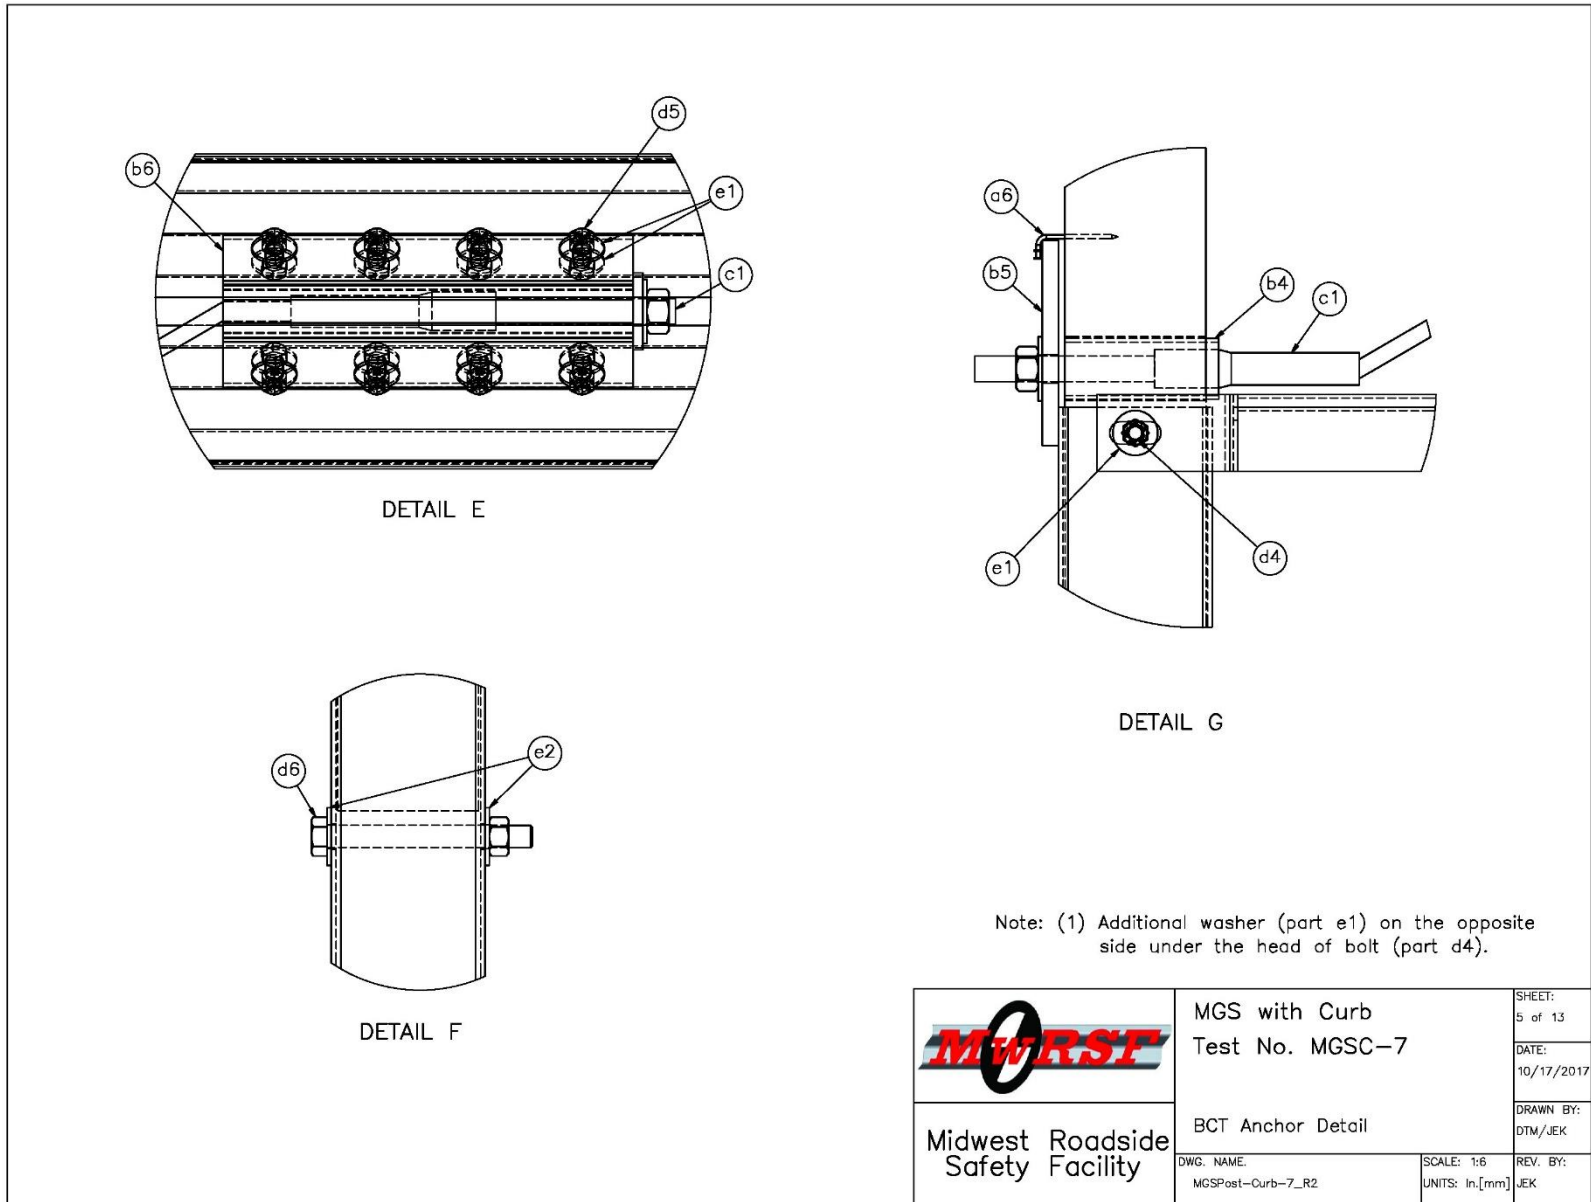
BCT Anchor Detail, Test No. MGSC-7
